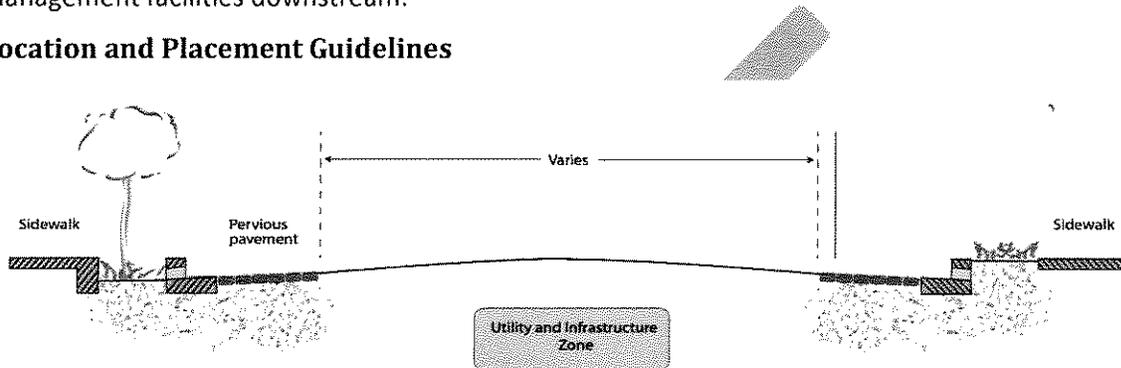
Possible pervious pavement design layout (*Model for Living Streets Design Manual, 2011*).
